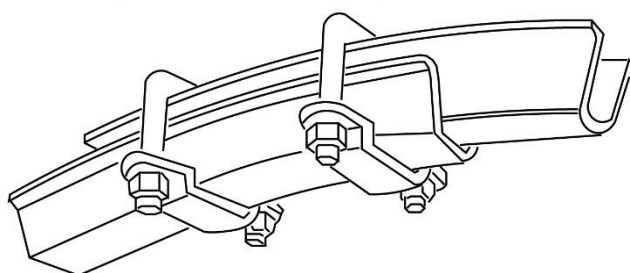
Assembly of a sliding joint in a Toussaint- Heintzmann or Top Hat section steel rib (modified after Hoek, 1998).
